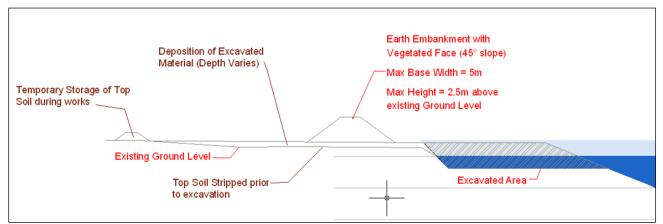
Typical Detail of the Proposed Bank Side Spoil Heaps
